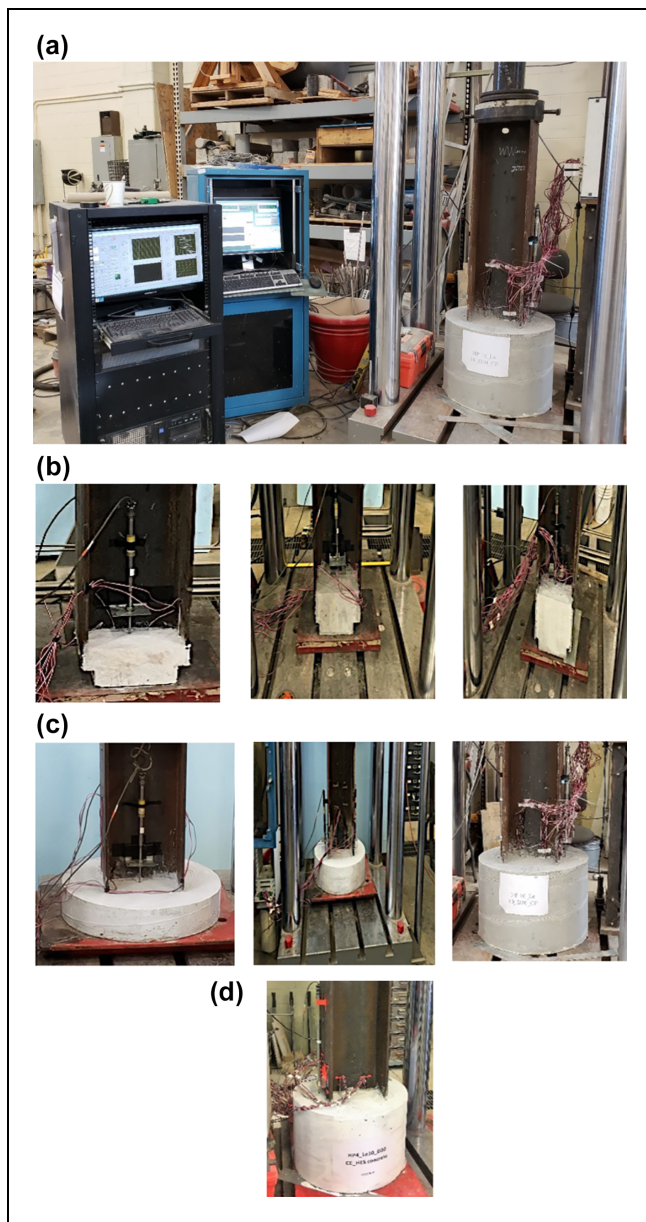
Concrete-encased steel H-piles: (a) test layout, (b) prism-type encased specimens, (c) cylindrical-type encased specimens, and (d) conventional concrete (CC) specimen.
